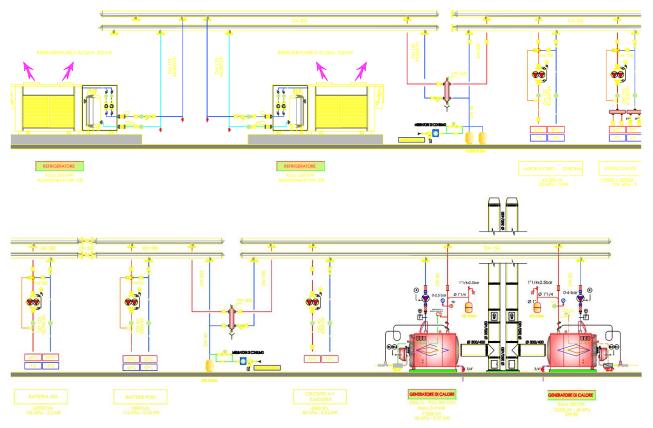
Detailed technical drawings of the thermal plant in the BOAT building
